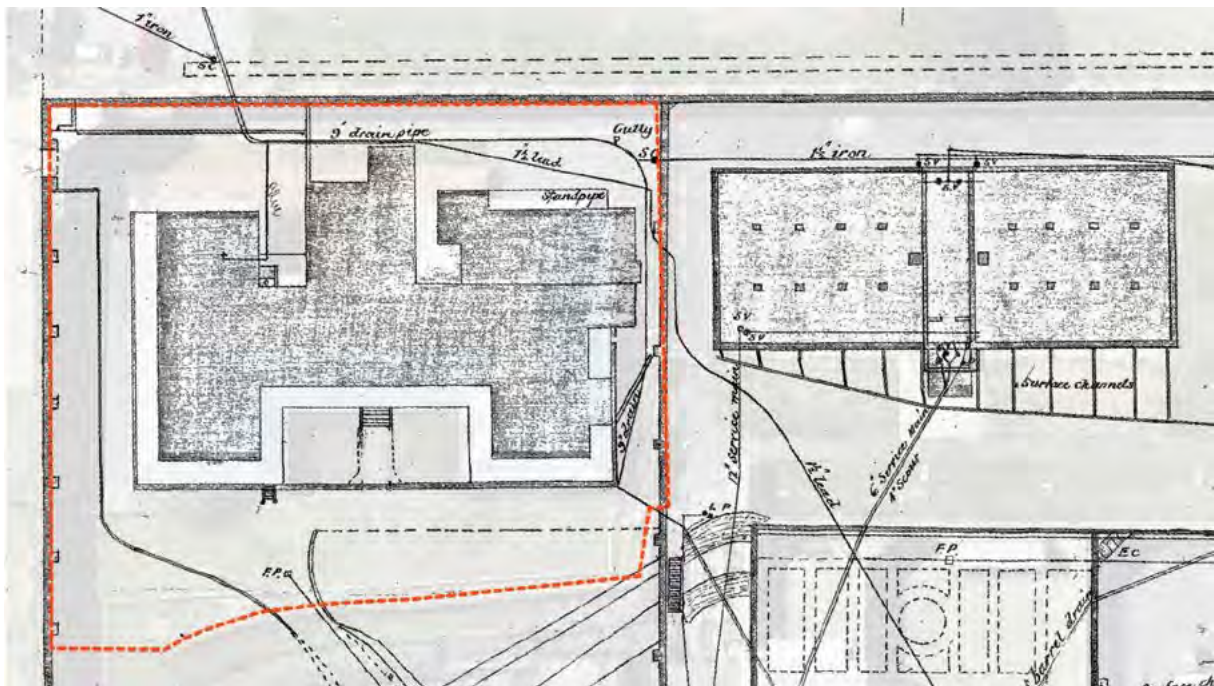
The 'Plan of Fremantle Gaol' c.1895 shows the Hospital building in its current location, as well as the wall separating the Hospital Yard from the Reservoir and Bath House structures.
